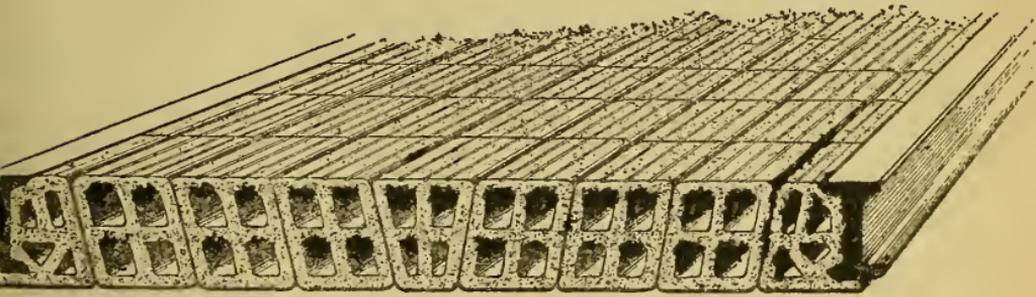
HOW THE HOLLOW TILES OF A FLOOR ARCH ARE ARRANGED.
